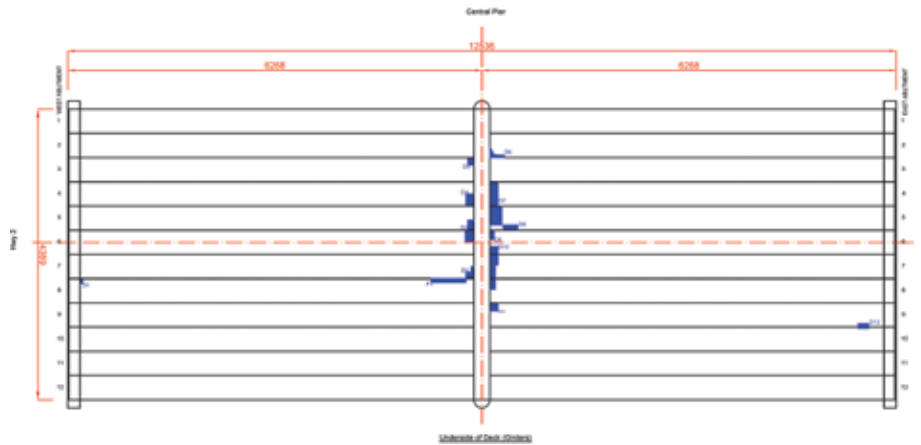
Delamination zones (in blue) on the LaSalle Causeway bridge were identified through visual inspection and hammer sounding
